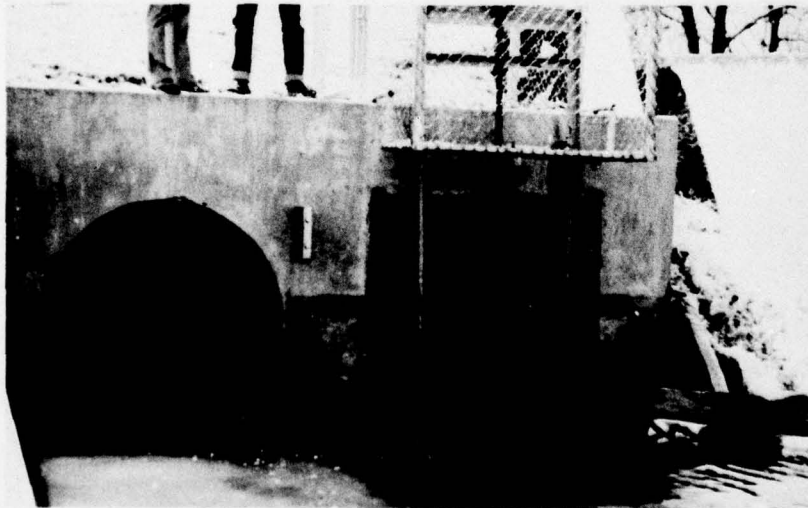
Close-up of downstream face of right abutment wingwall showing plugged 54-inch dia. diversion pipe used during construction, and face mounted 36-in. dia. low level outlet gate
